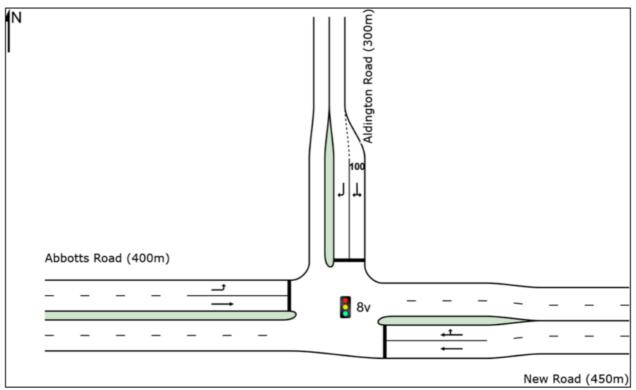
Interim 2026 SIDRA Intersection Layout - Abbotts Road/Aldington Road (Source: Ason Group 2021)
